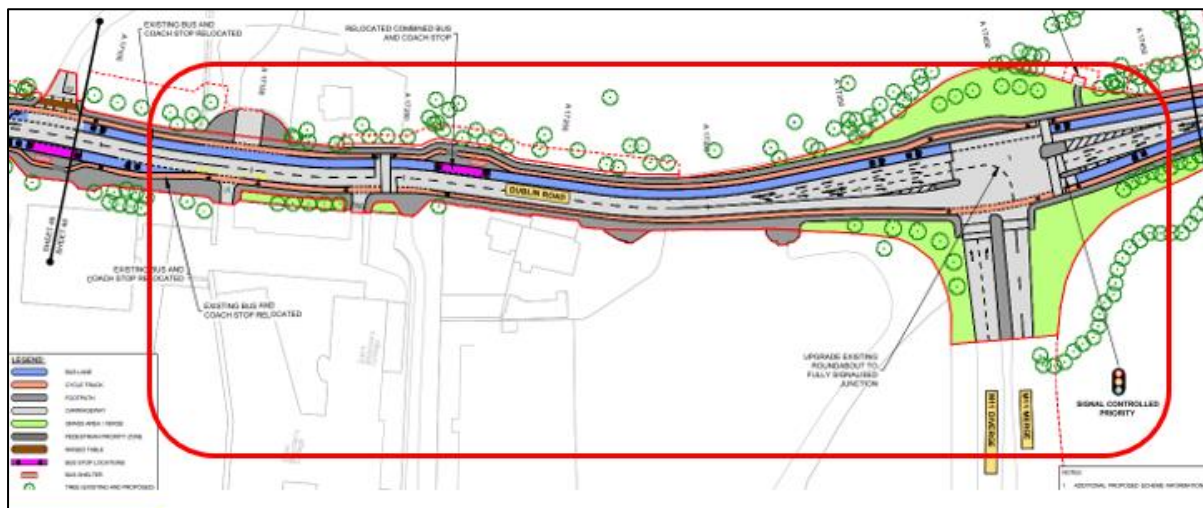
Extract from General Arrangement Drawing Dublin Road Wilford Roundabout (Sheet 49)
